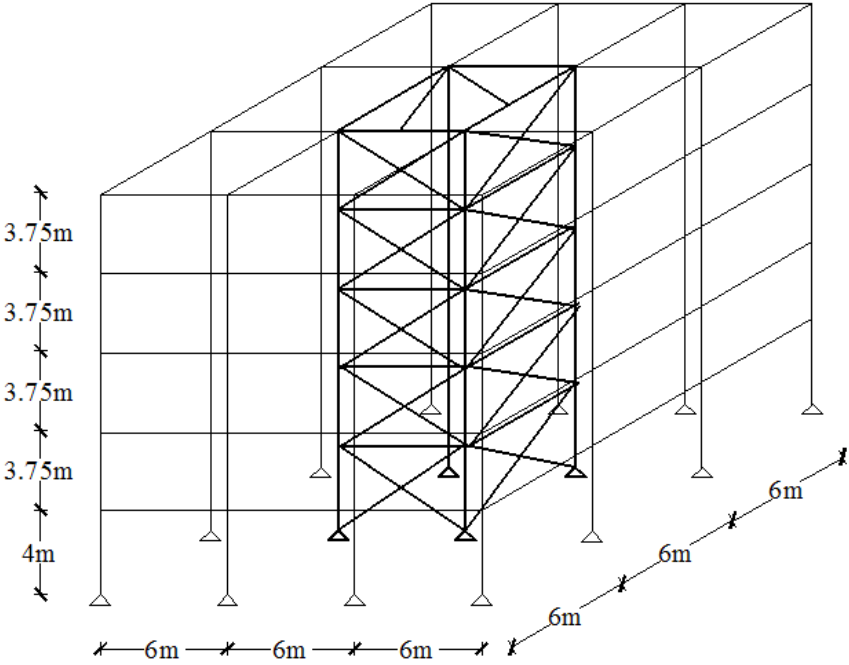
Symmetrical Plan and Section core cross bracing.
